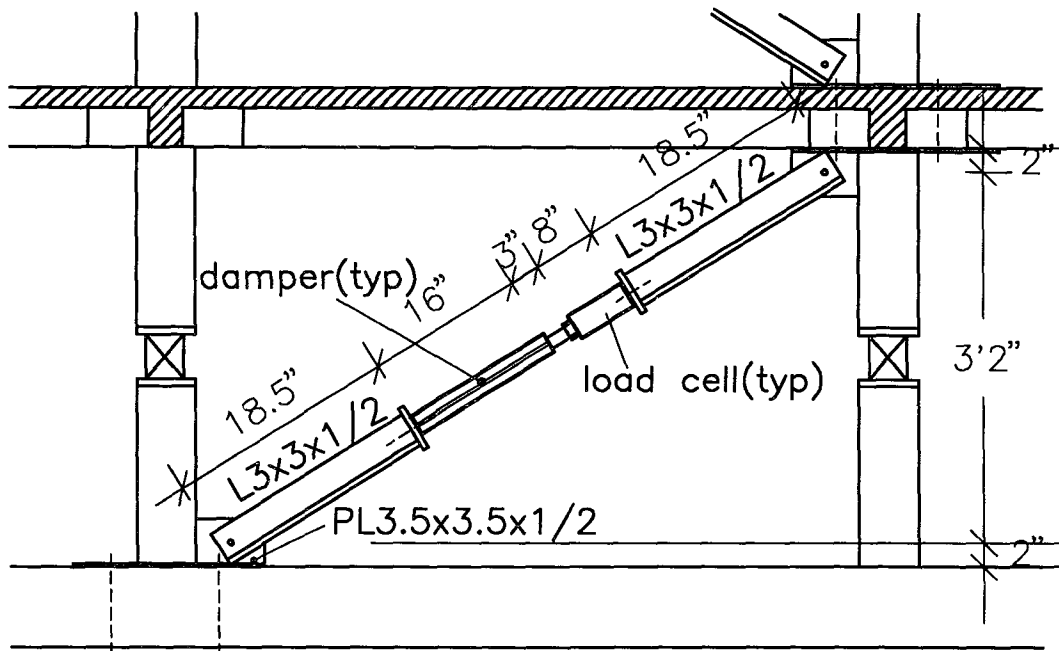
Installation Detail of a Tekton Friction Damper Installed in the Mid-bay of the Frame
